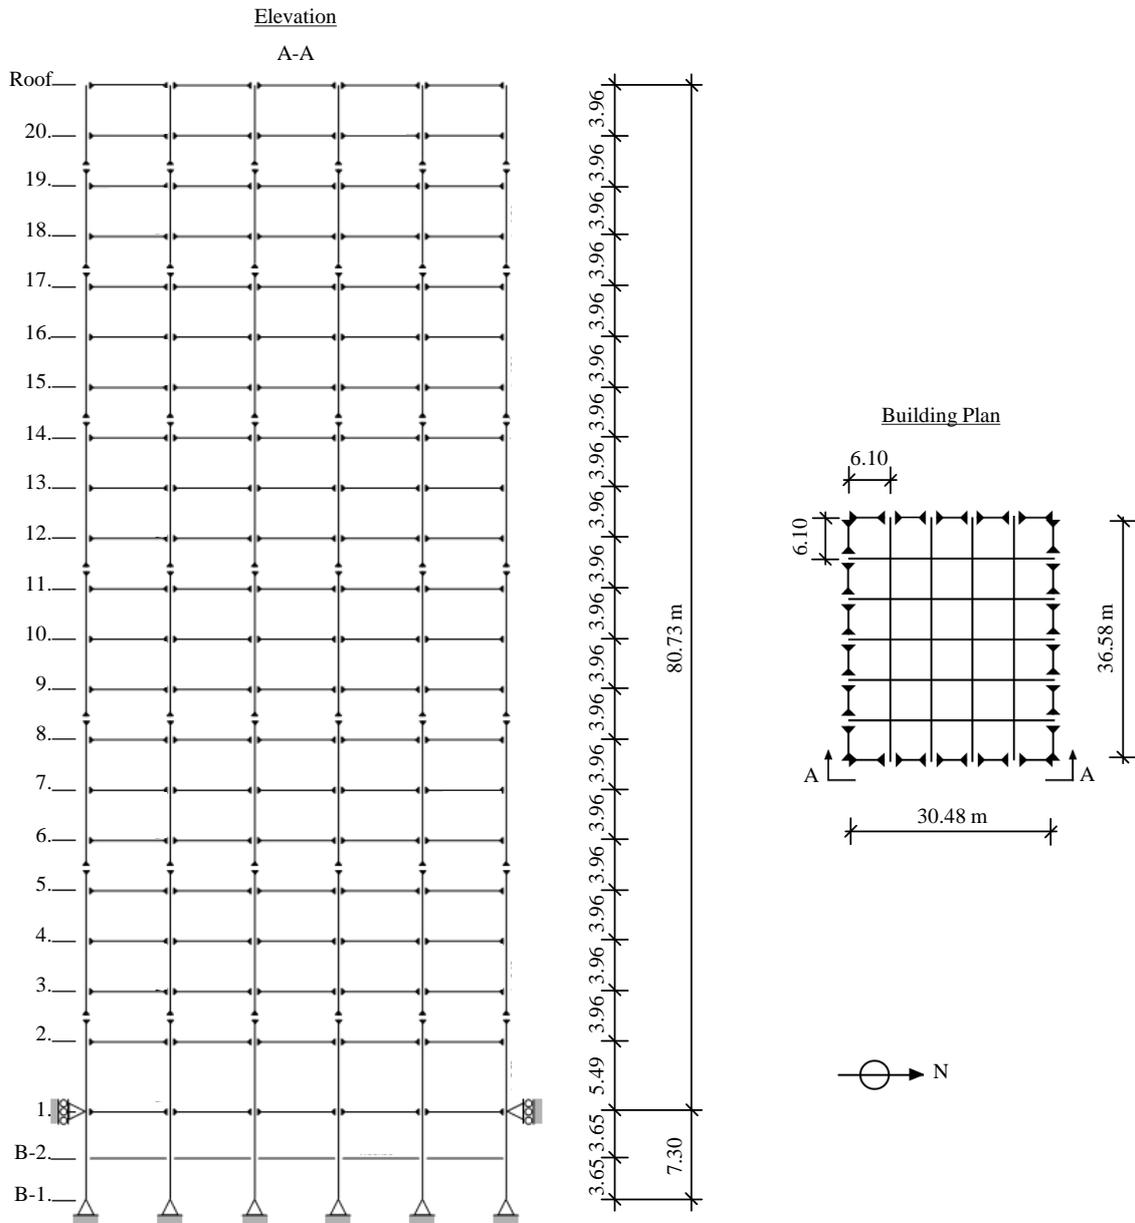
The 20-story steel frame benchmark building (Spencer et al., 1998)
